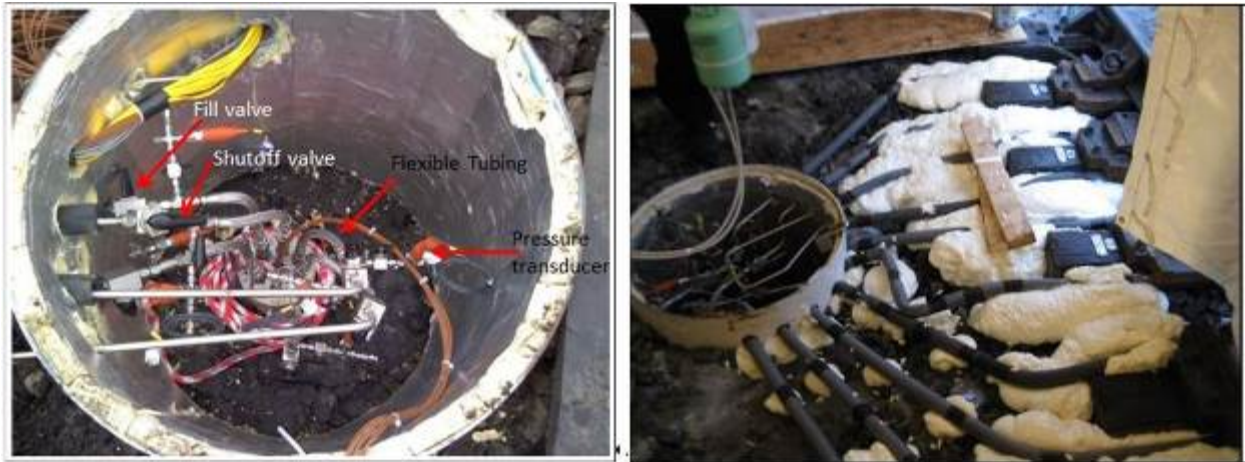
(left) Vault Interior Details (right) Tubing Support Insulation
